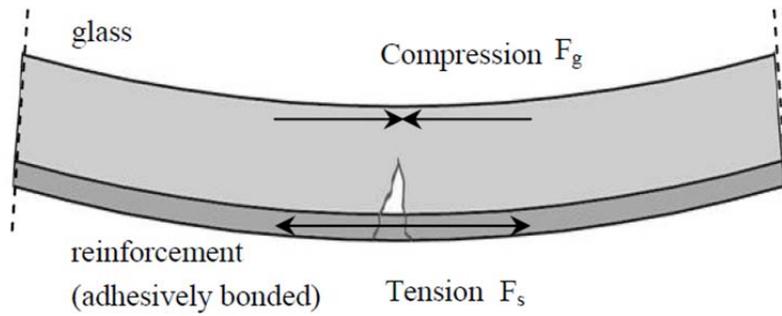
Schematic overview of reinforced glass beam (Louter et al. 2005)
